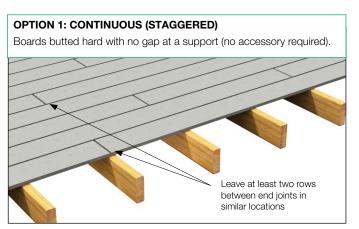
A STAGGERED LAYOUT BUTT JOINTS
